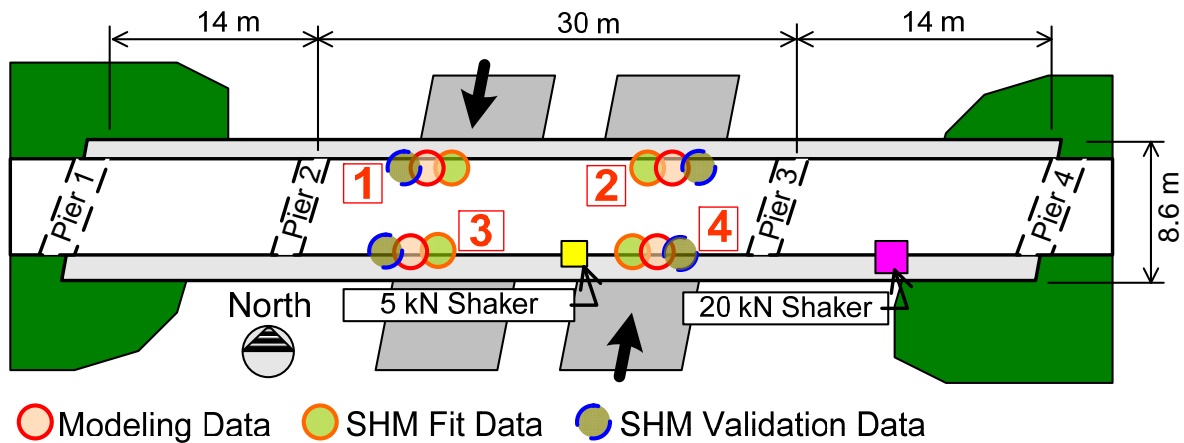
Sensor Layout of accelerometers on the Z24 bridge.
